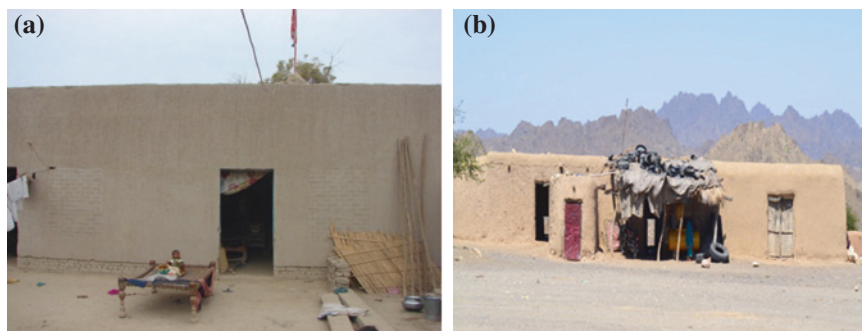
Adobe houses in Pakistan. a Adobe house in Sindh. b Adobe house in Khuzdar (Courtesy Prof Sarosh Lodi)
